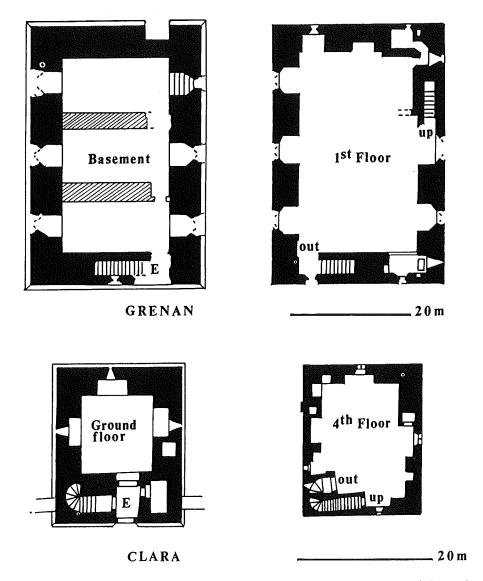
Plans of Grenan keep (early 13th century) and Clara tower-house (15th century). E: Entrance; out: exit from stairs; up: entry to stairs.
